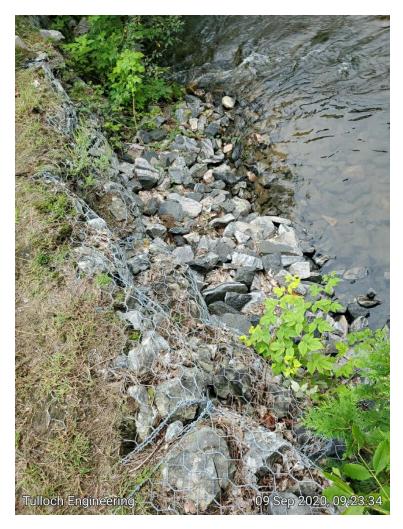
Gabion wall at toe of North Slope. Note rockfill located at toe of gabion wall above tailrace water level.
